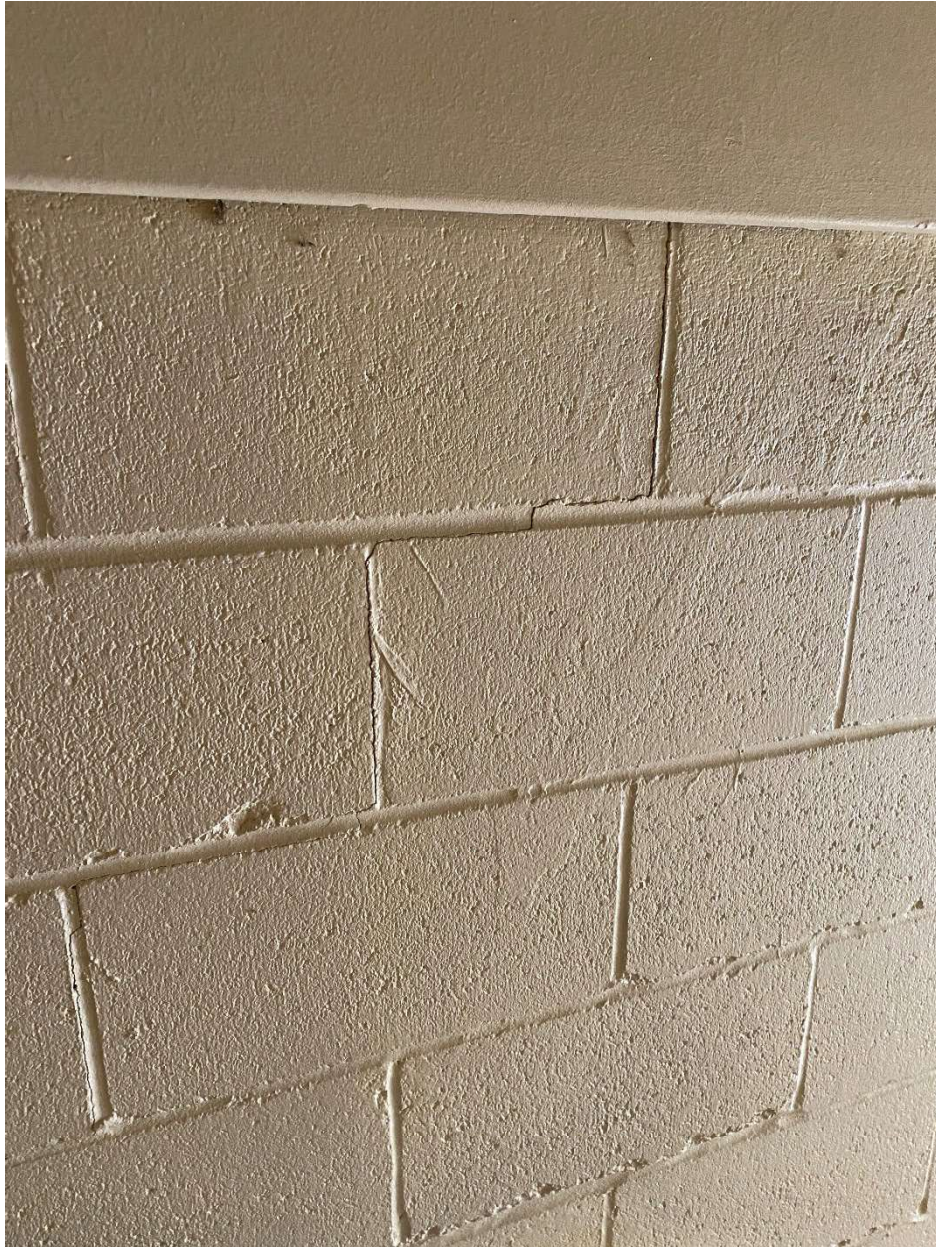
Step Cracks Near North End of East Foundation Wall – Interior View
